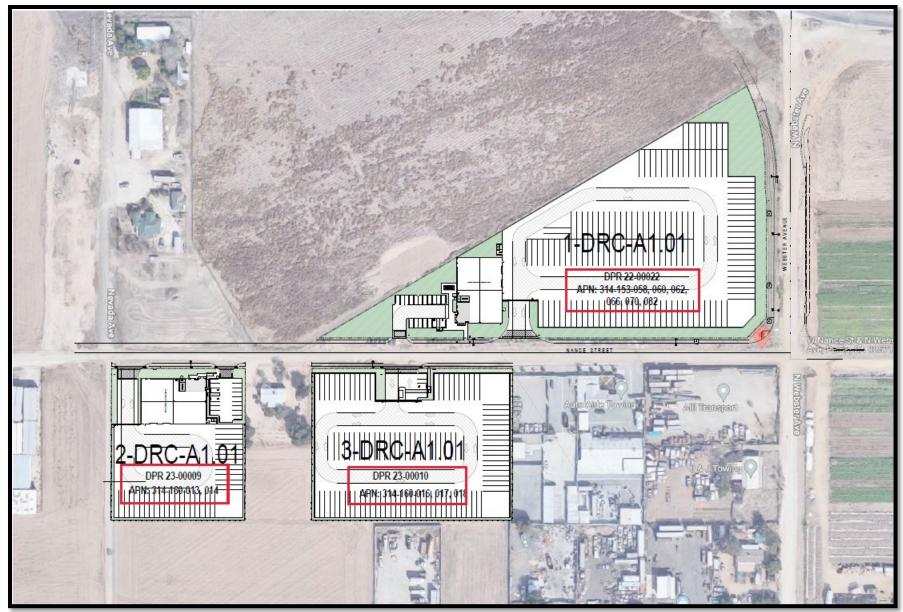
Site Plan Schematic Source: SKH Architectural Design
